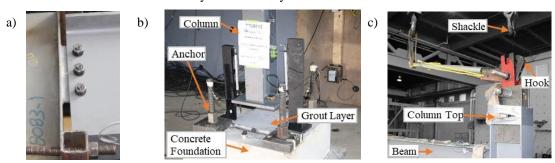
Details of the test specimen: (a) Beam-to-column connection; (b) Base of the uplifted GCRBF column; and (c) Uplift trigger mechanism of the rocking column.
